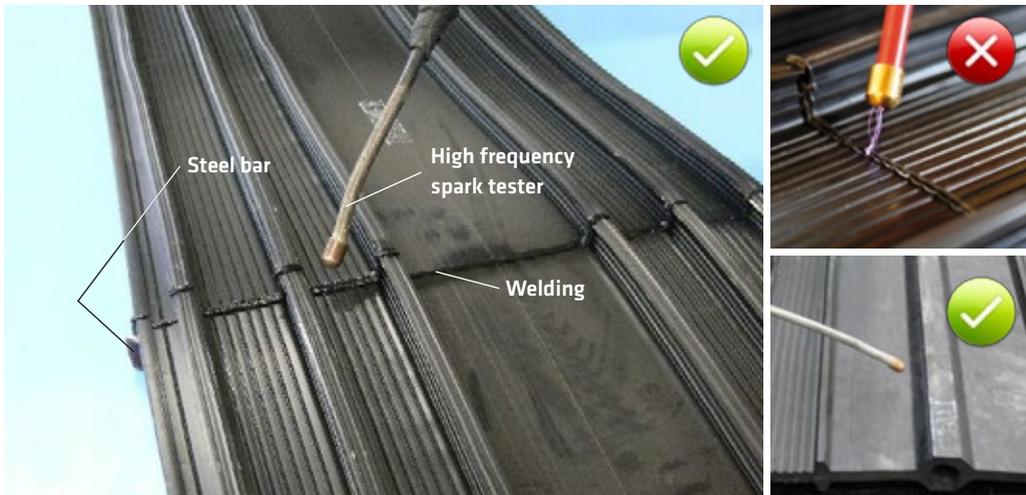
Non-destructive testing of the impermeability of a weld with a high frequency spark tester; a visible spark passing through indicates a defect in the weld
